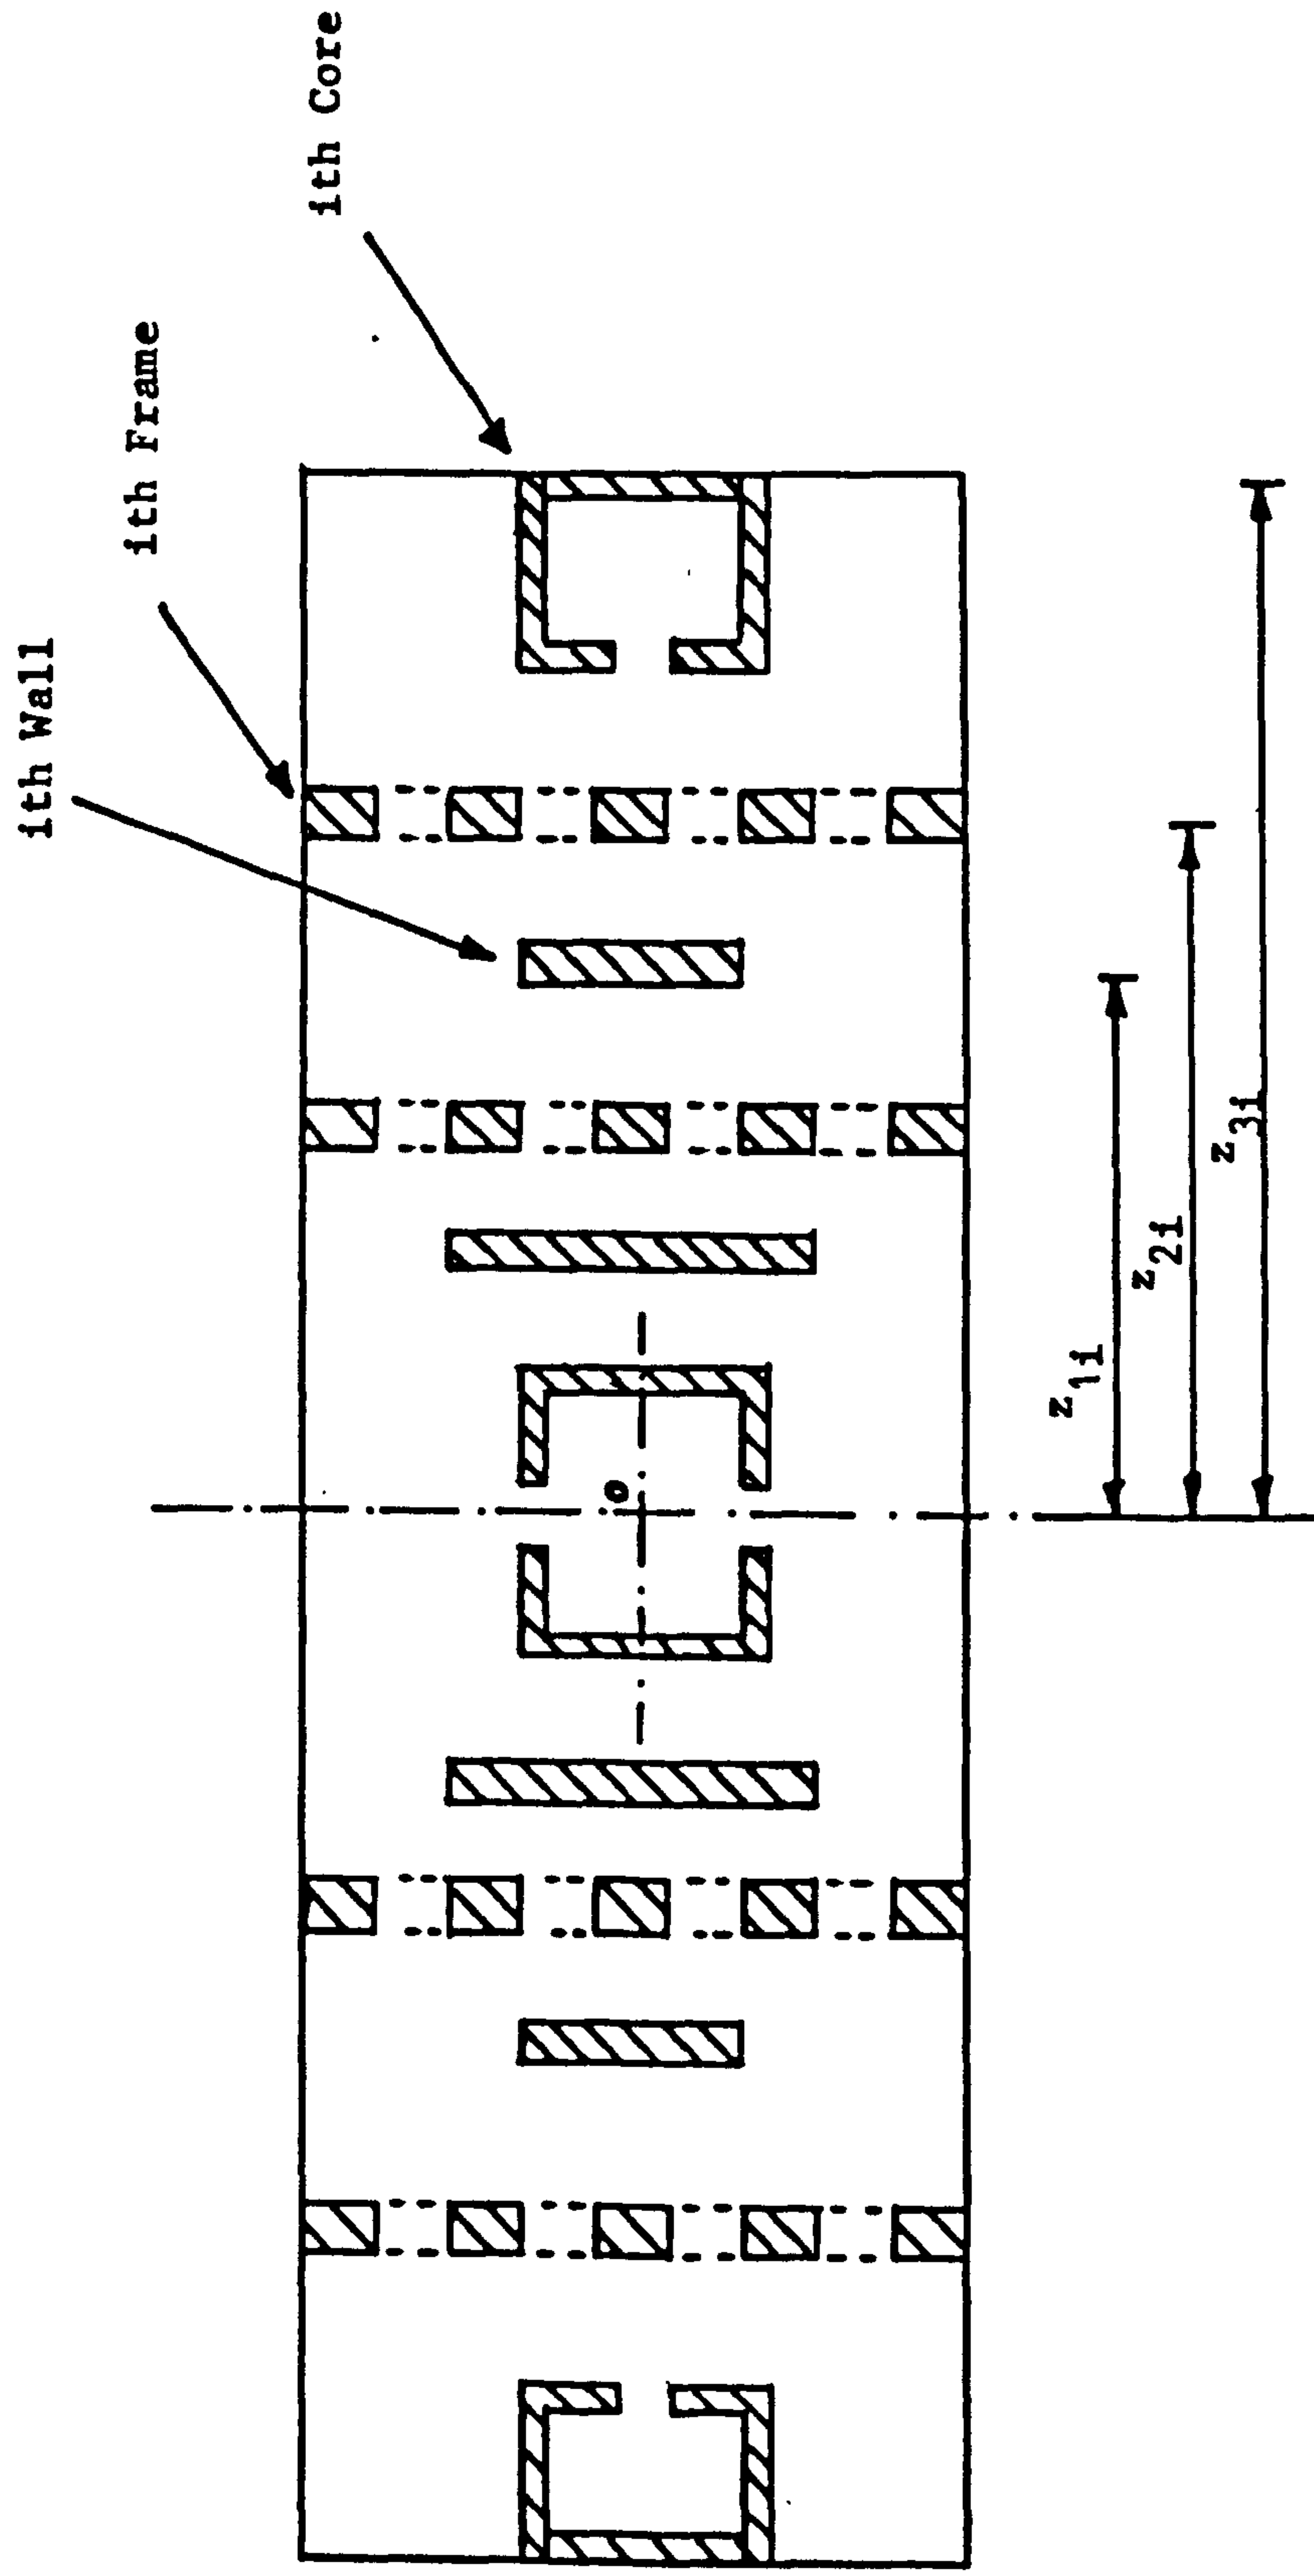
Symmetrical structure consisting of independent walls, cores and rigidly jointed frames.
